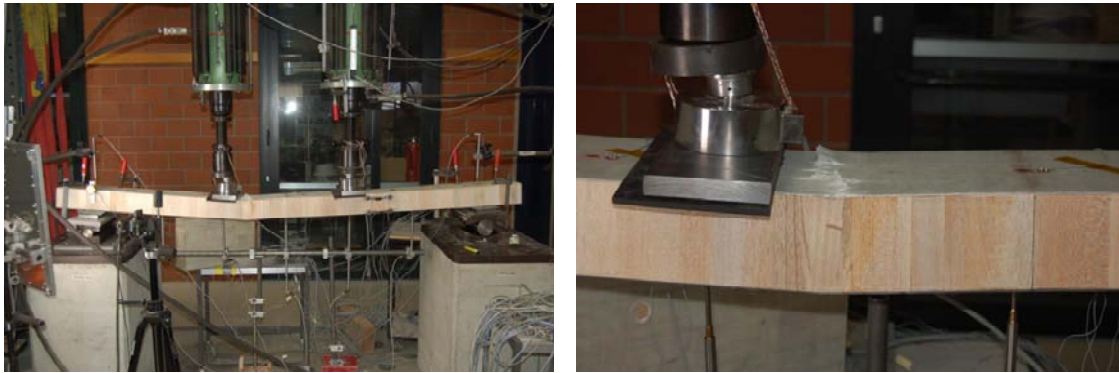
Failure of beam B-H-1 (left), zoom of detailed failure mode (right)
